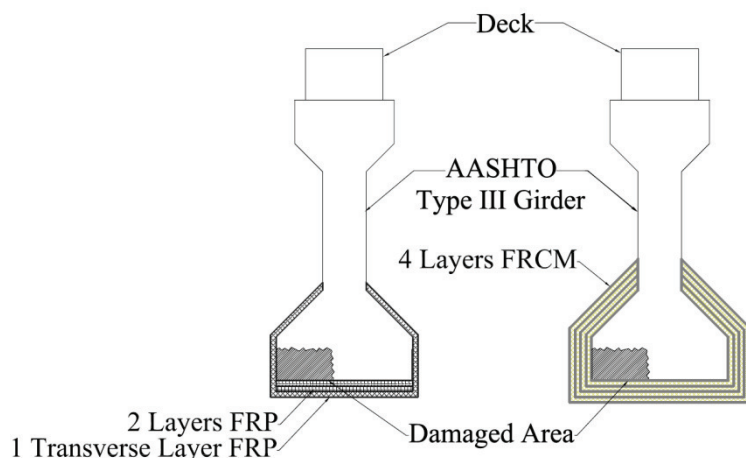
Strengthening Configuration for Girder C (left) and Girder D (right)
